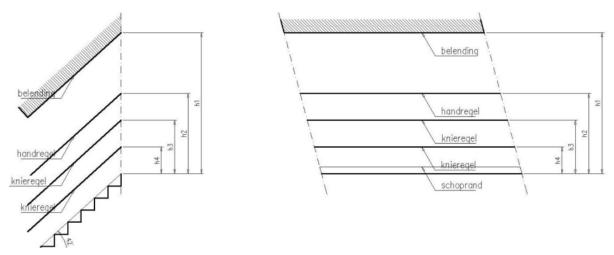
, (height of fall > 13m, handrails on stairs and landings with double knee rail)
